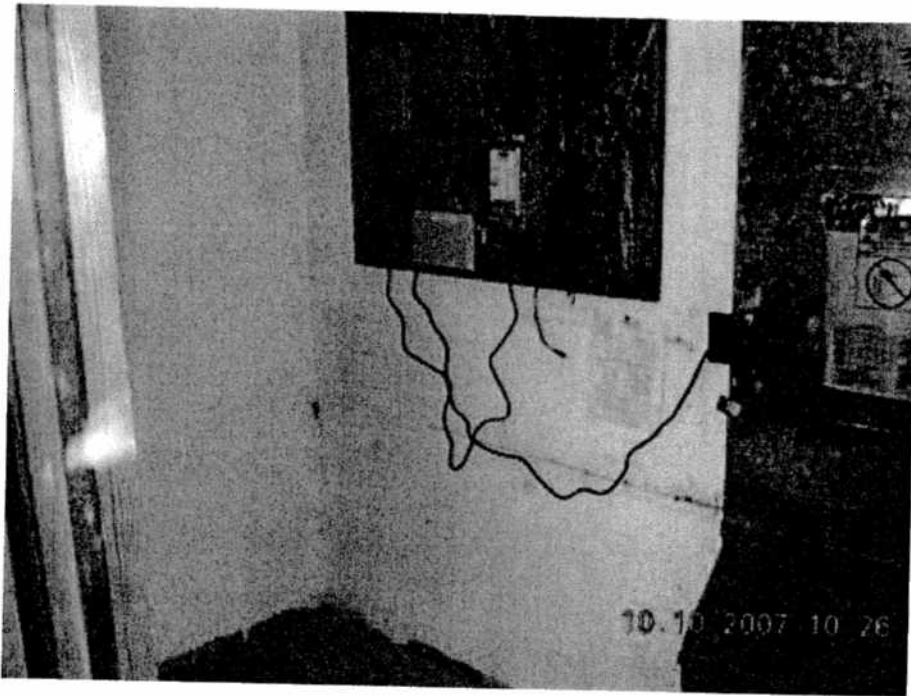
The utility closet off of the main hallway with air conditioning plenum.
